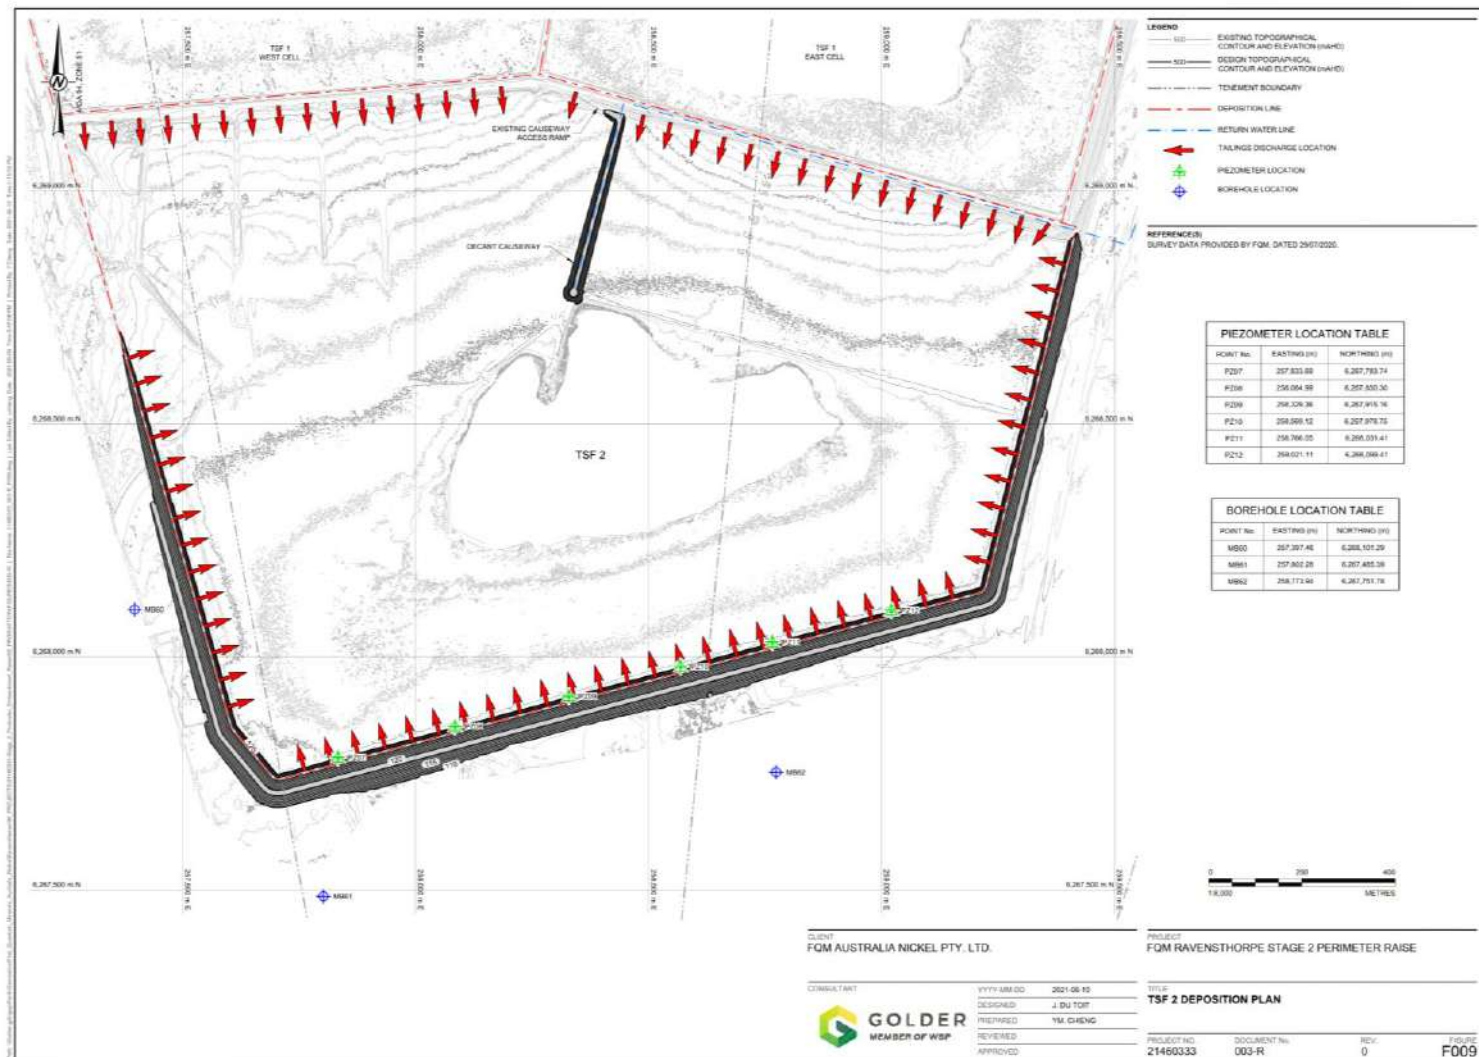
TSF2 Tailings Deposition Pipeline Plan
